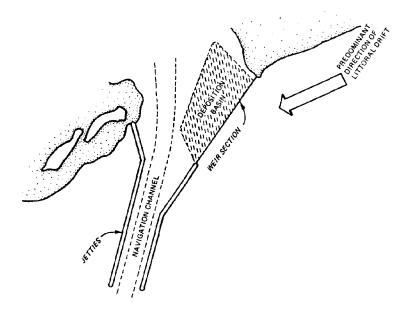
Sand bypassing, Murrells Inlet, South Carolina
